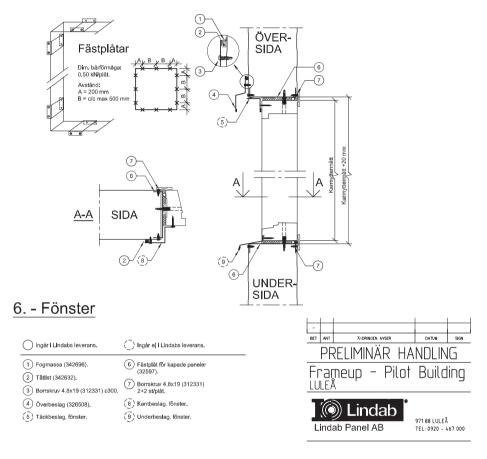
Façade - extract of the drawings provided by LindAB [28]
